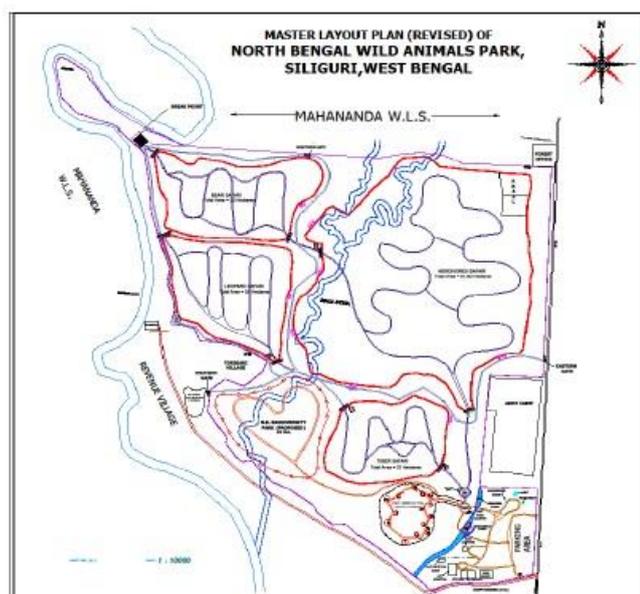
Layout plan of the North Bengal Wild Animals Park (Bengal Safari)
